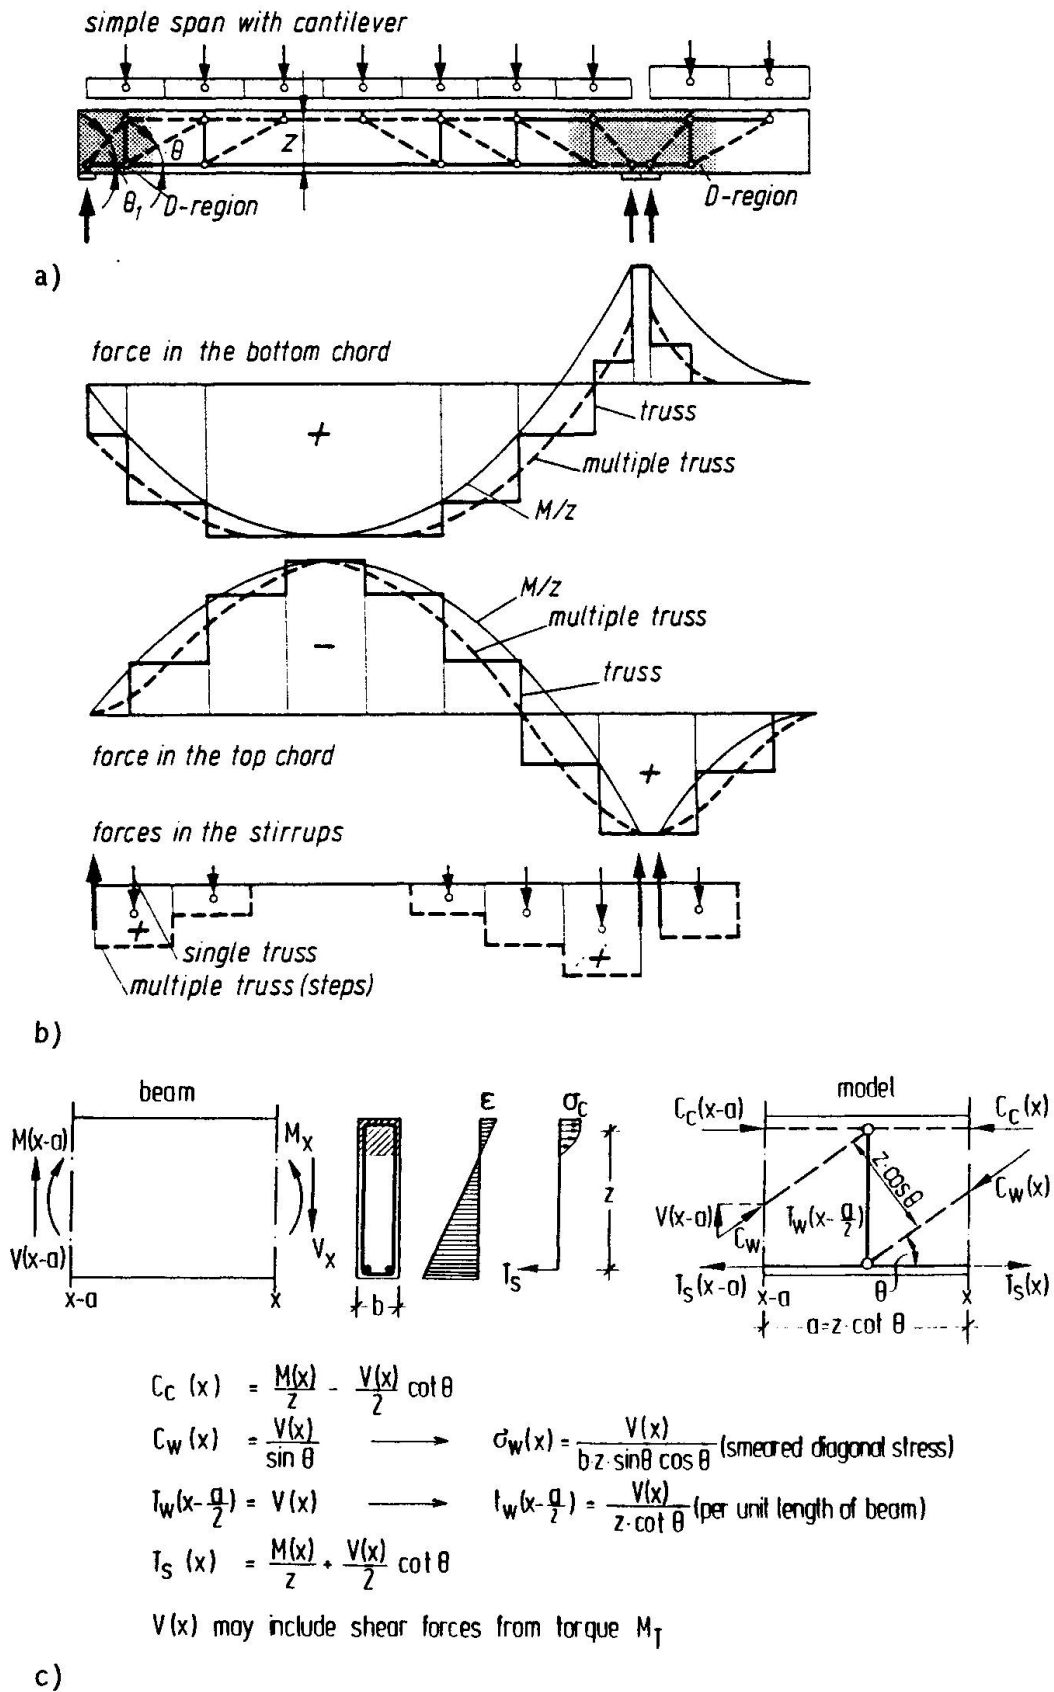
Truss model of a beam with cantilever: (a) model; (b) distribution of inner forces; (c) magnitude of inner forces derived from equilibrium of a beam element.
